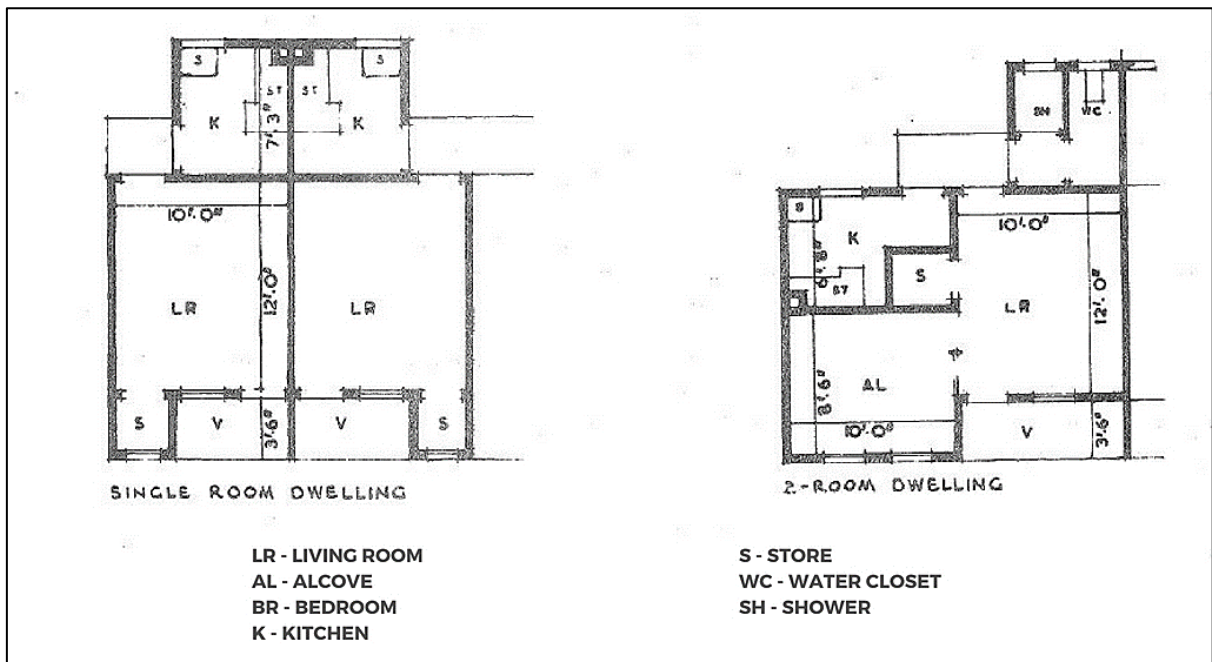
LEDB floor plans for single room and double room housing units; source: The Overseas Building Notes (1958, p.53/23).
